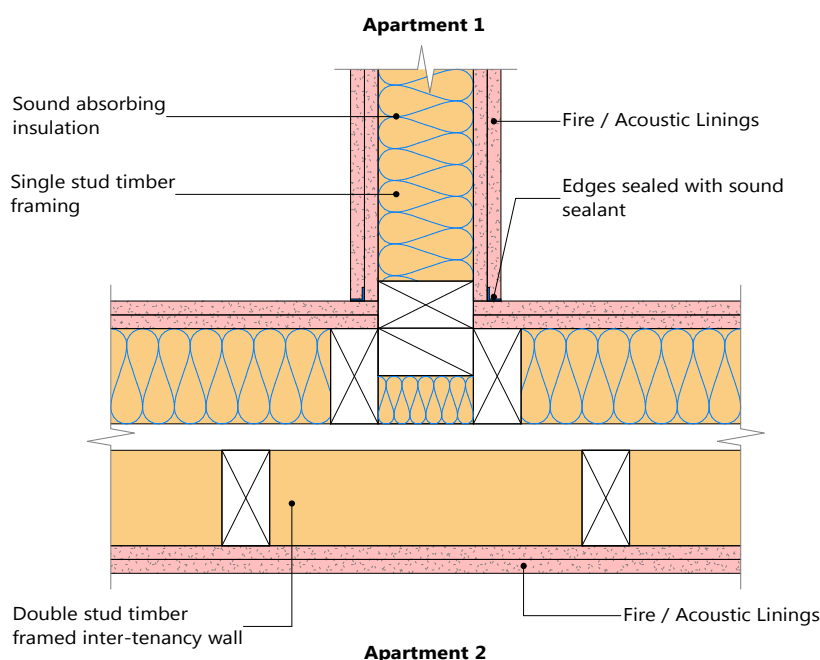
Double-stud intertenancy wall / loadbearing internal wall junction.
